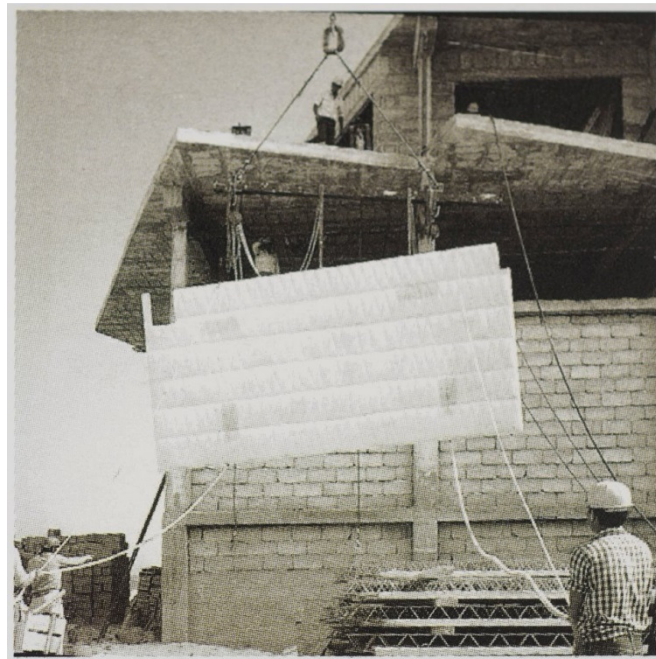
Fabric-formed concrete cladding panels craned and installed. Hotel Islas Tres, Fuerteventura, 1975 (image copyright of Foundation Miguel Fisac)
